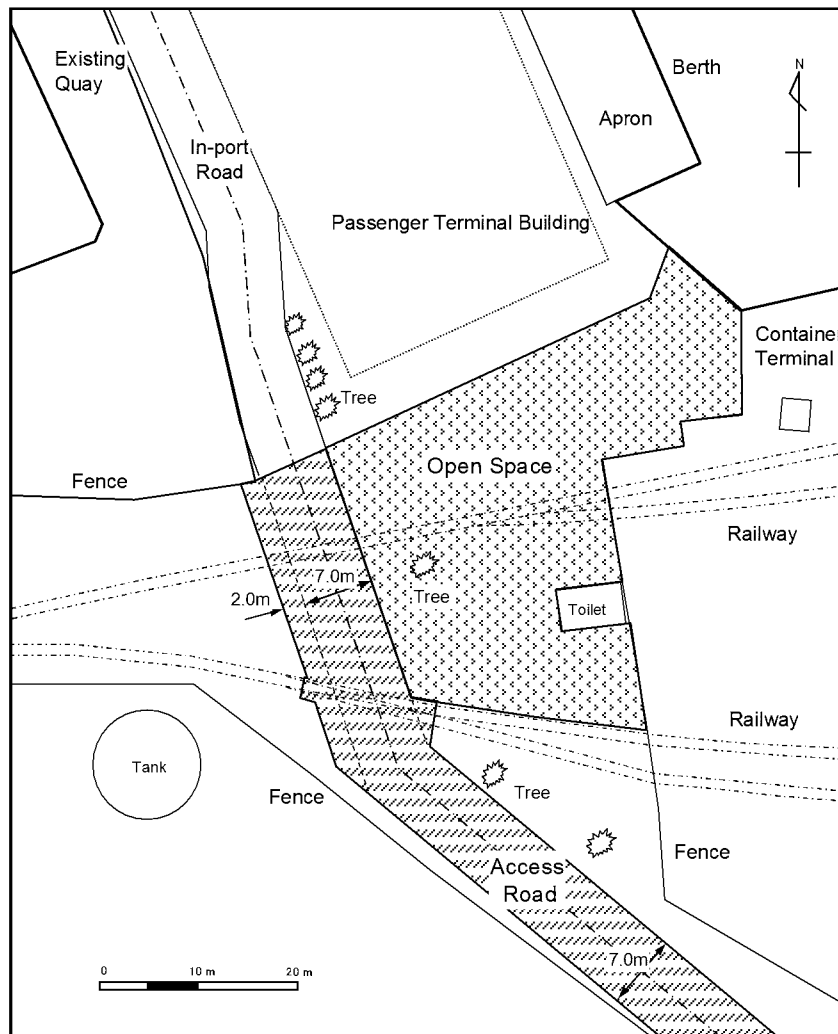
Paving Area of Open Space in front of Wharf
